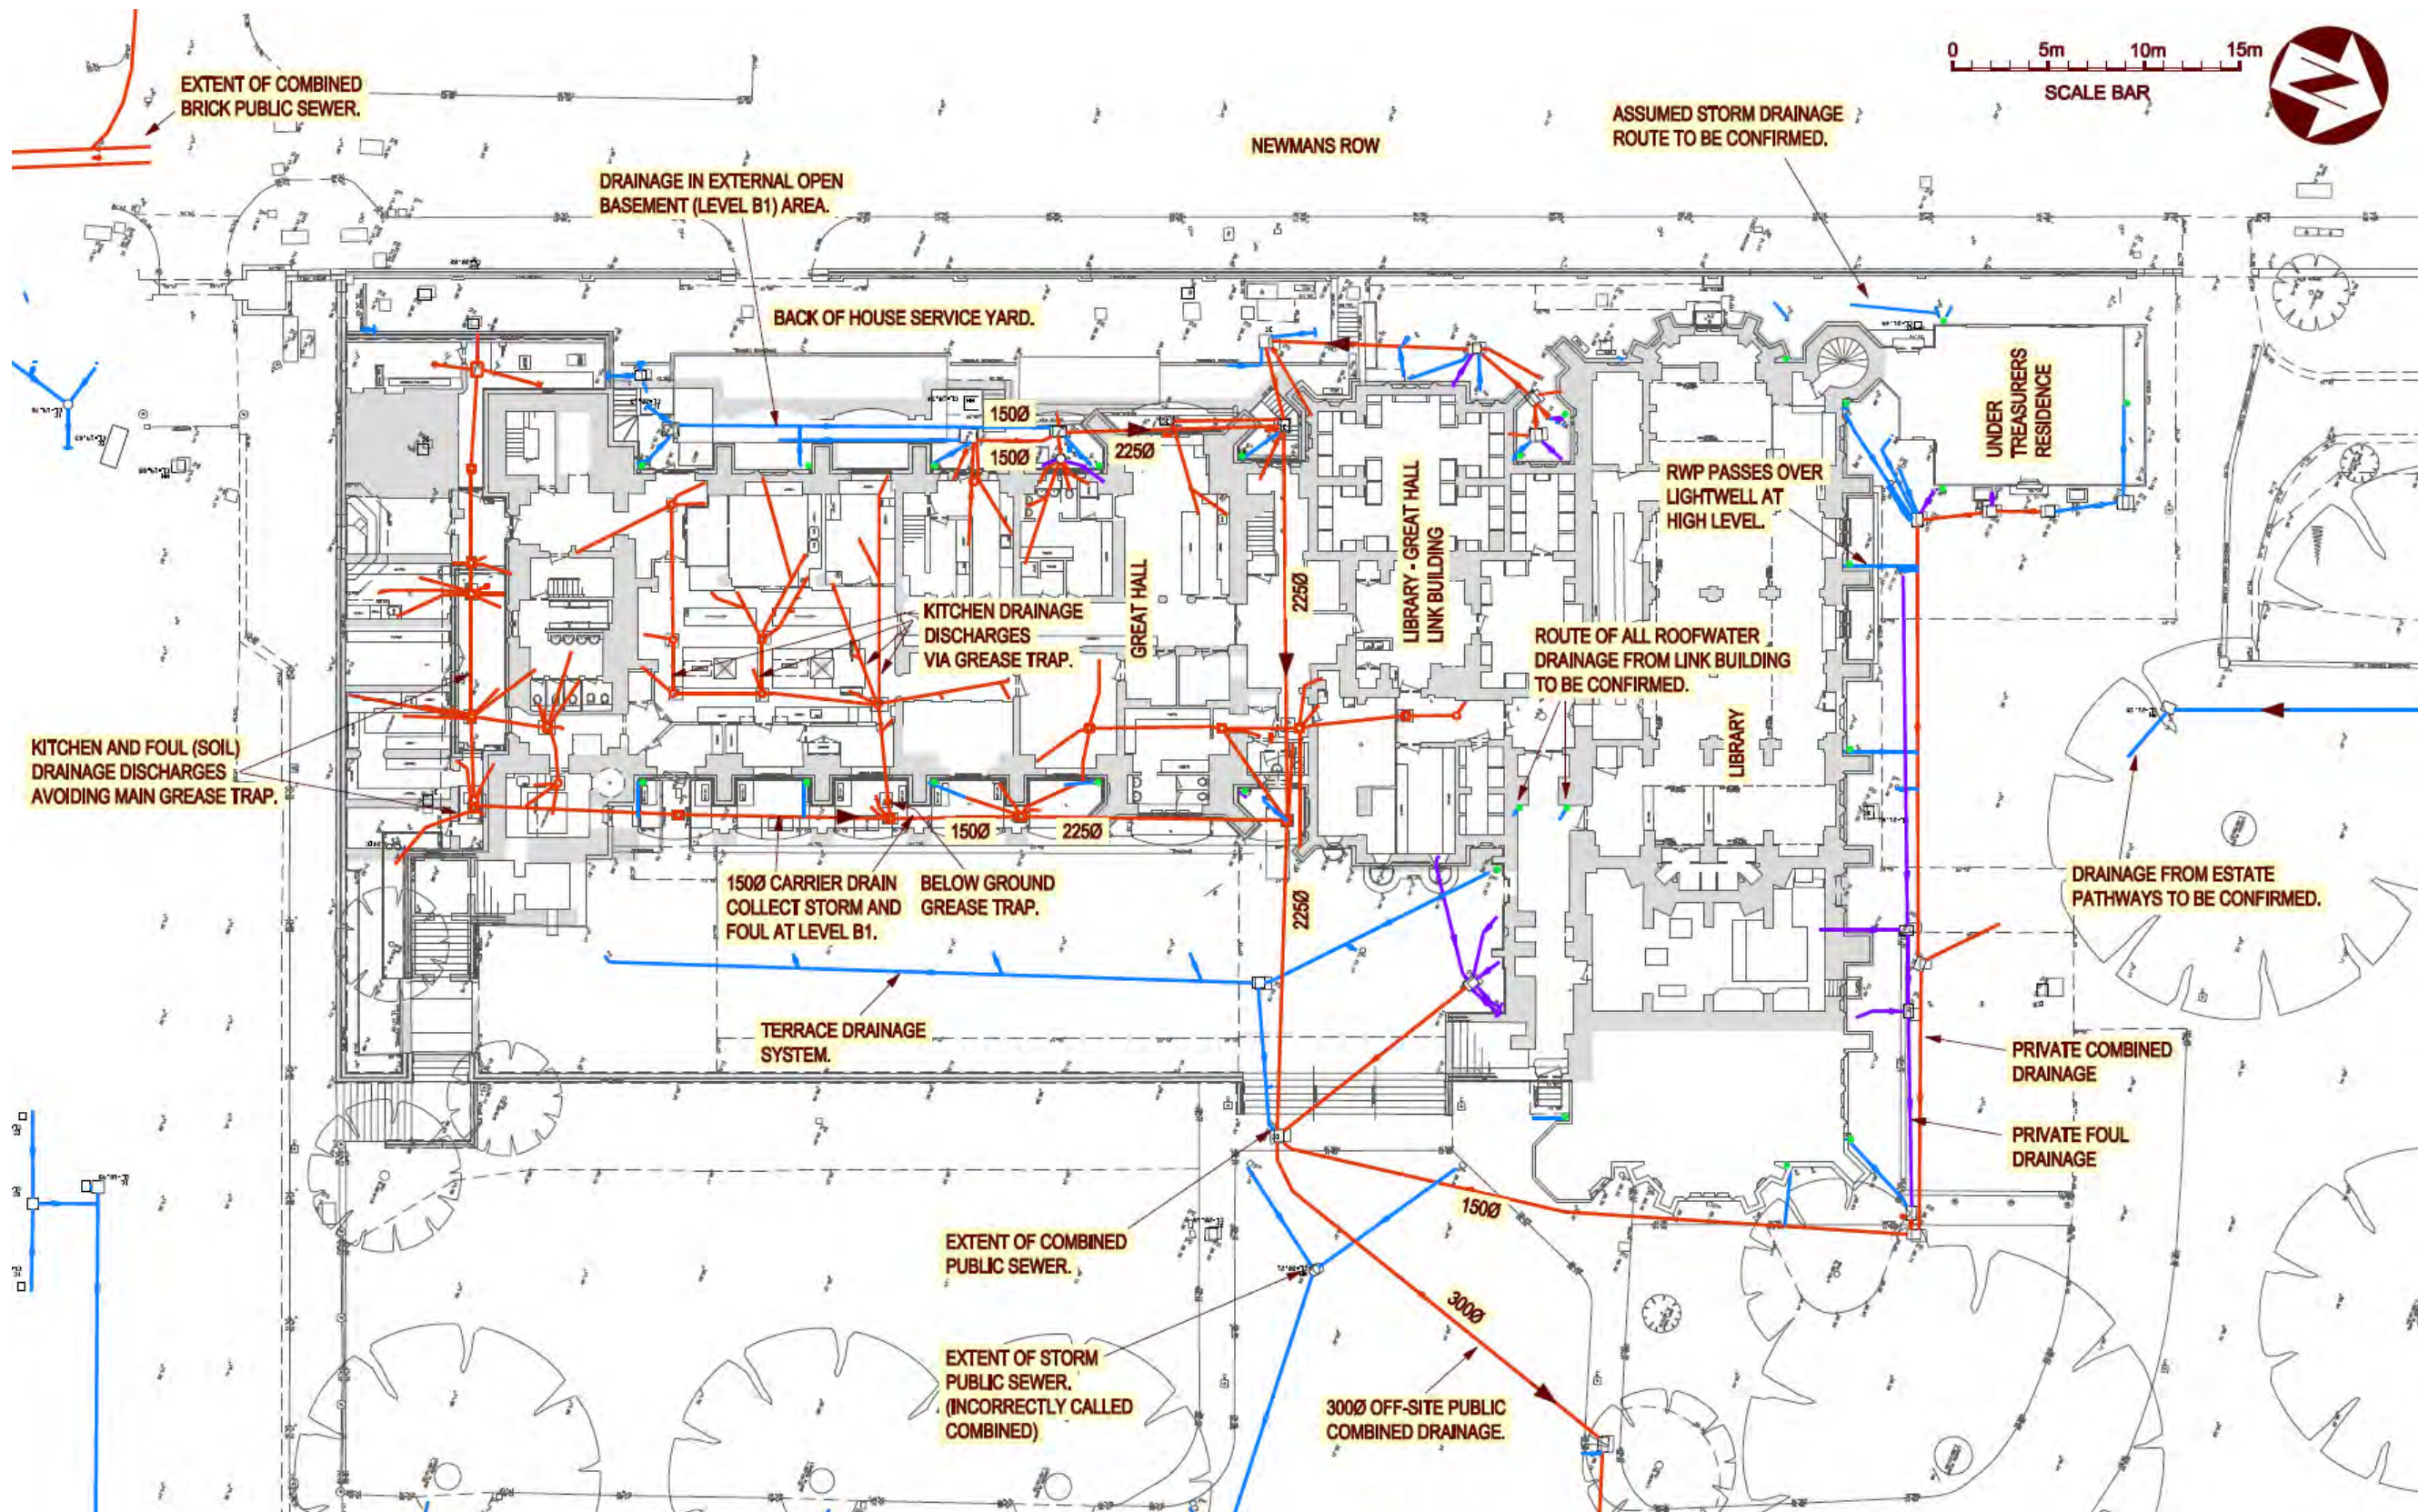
Existing Drainage – Showing Basement Level and External Areas.
